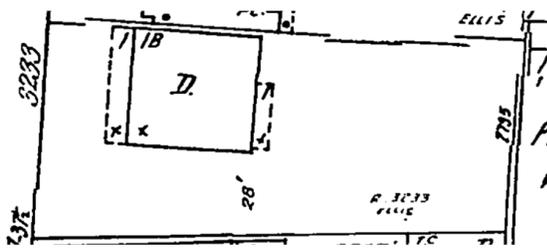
Site plans of 3233 Ellis Street in 1950. North is up.
